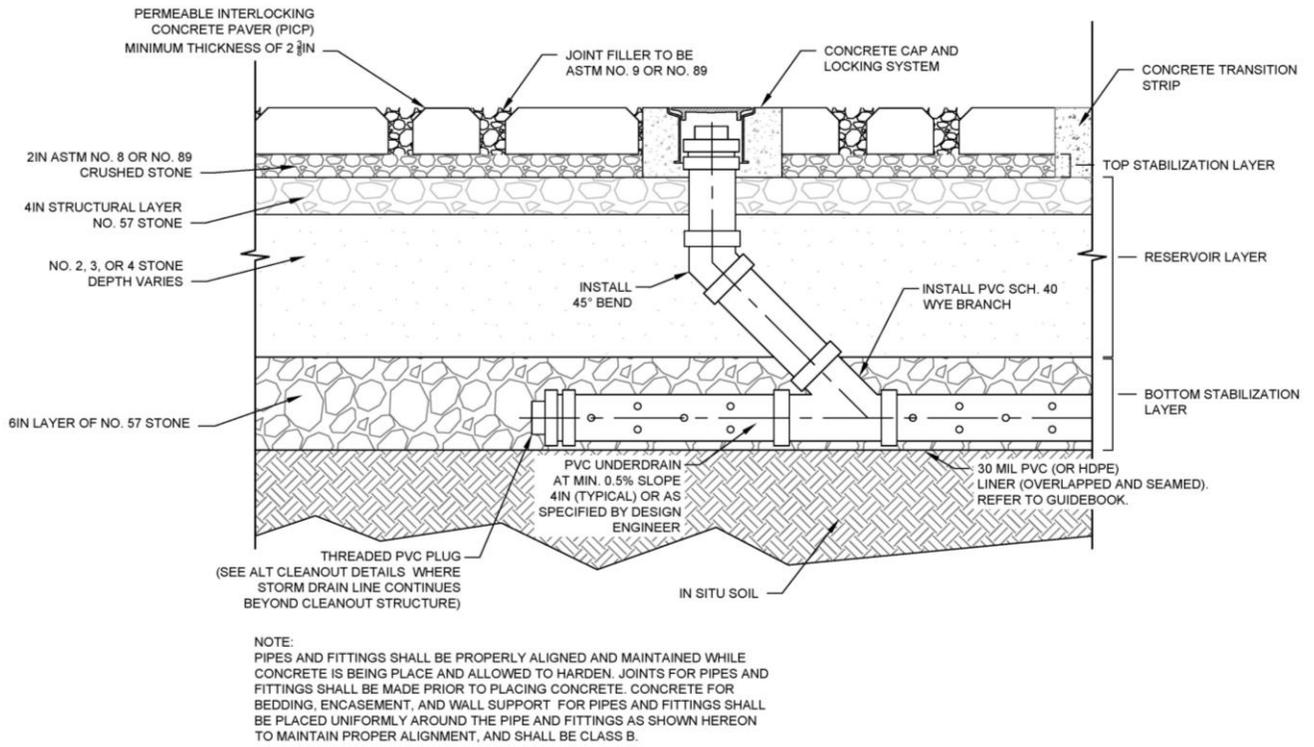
SINGLE FAMILY POROUS PAVER TYPICAL SECTION (WITH UNDERDRAIN)
